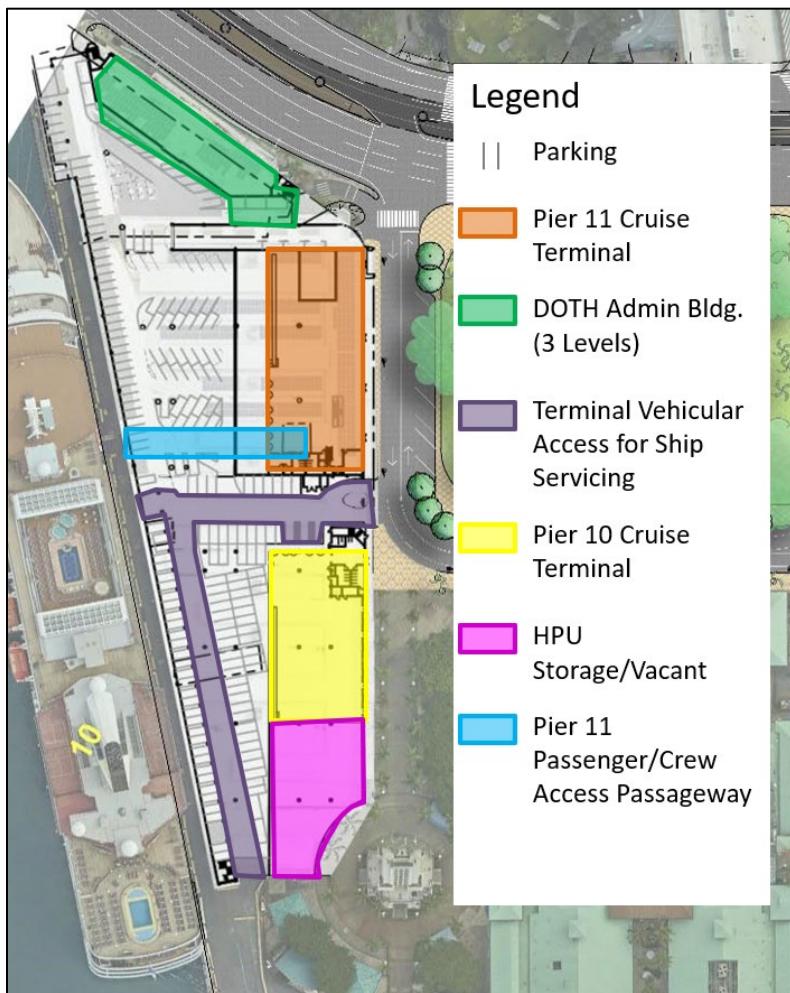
Piers 10 and 11 Existing Configuration – Ground Level
